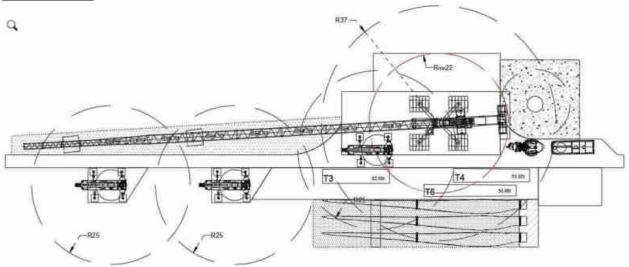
Example of assembly of the boom and storage of components on the Installation Area. T3, T4and T5 tower sections, Blades, Drive train, Hub and Nacelle will be installed by the Main Crane. At least 1m free walking area must be ensured around the components for visual inspection. Steel plates under components may be required to minimize the ground pressure.
